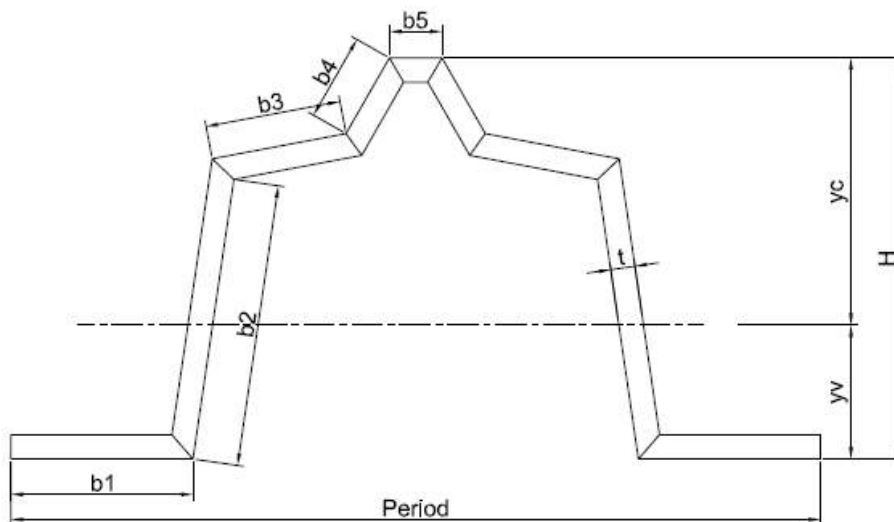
Idealised DC-780 corrugated wall cross-section at foot area
